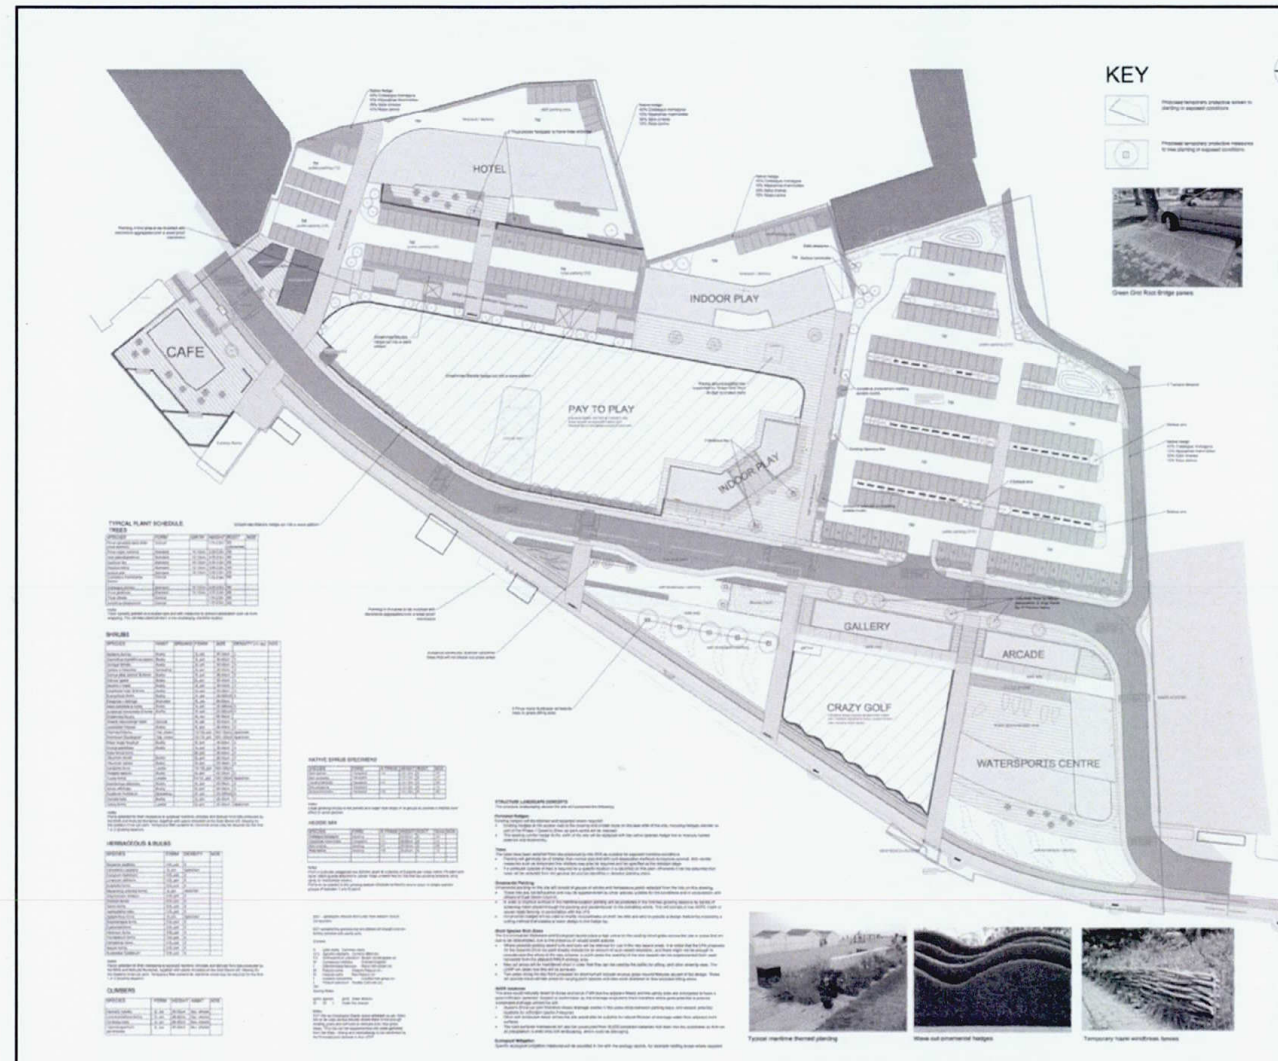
Detailed landscape design is submitted as part of the proposals
